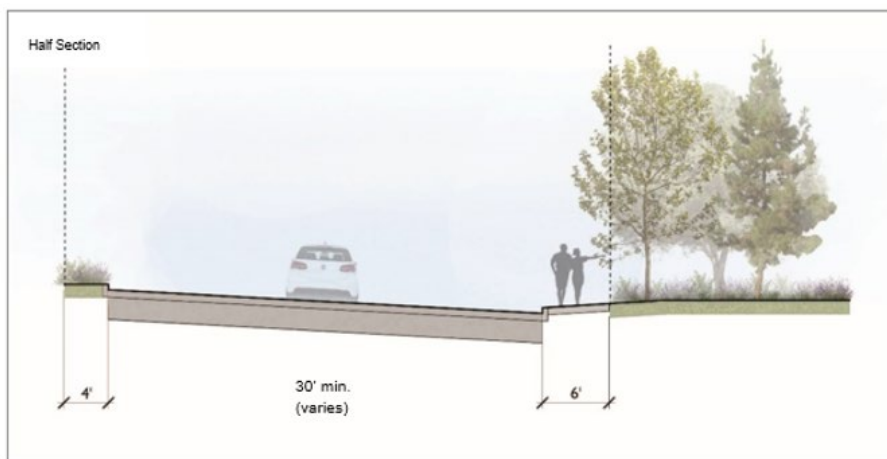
Local Street Cross-Section (Wallace Street & 34<sup>th</sup> Street<sup>2</sup>)
